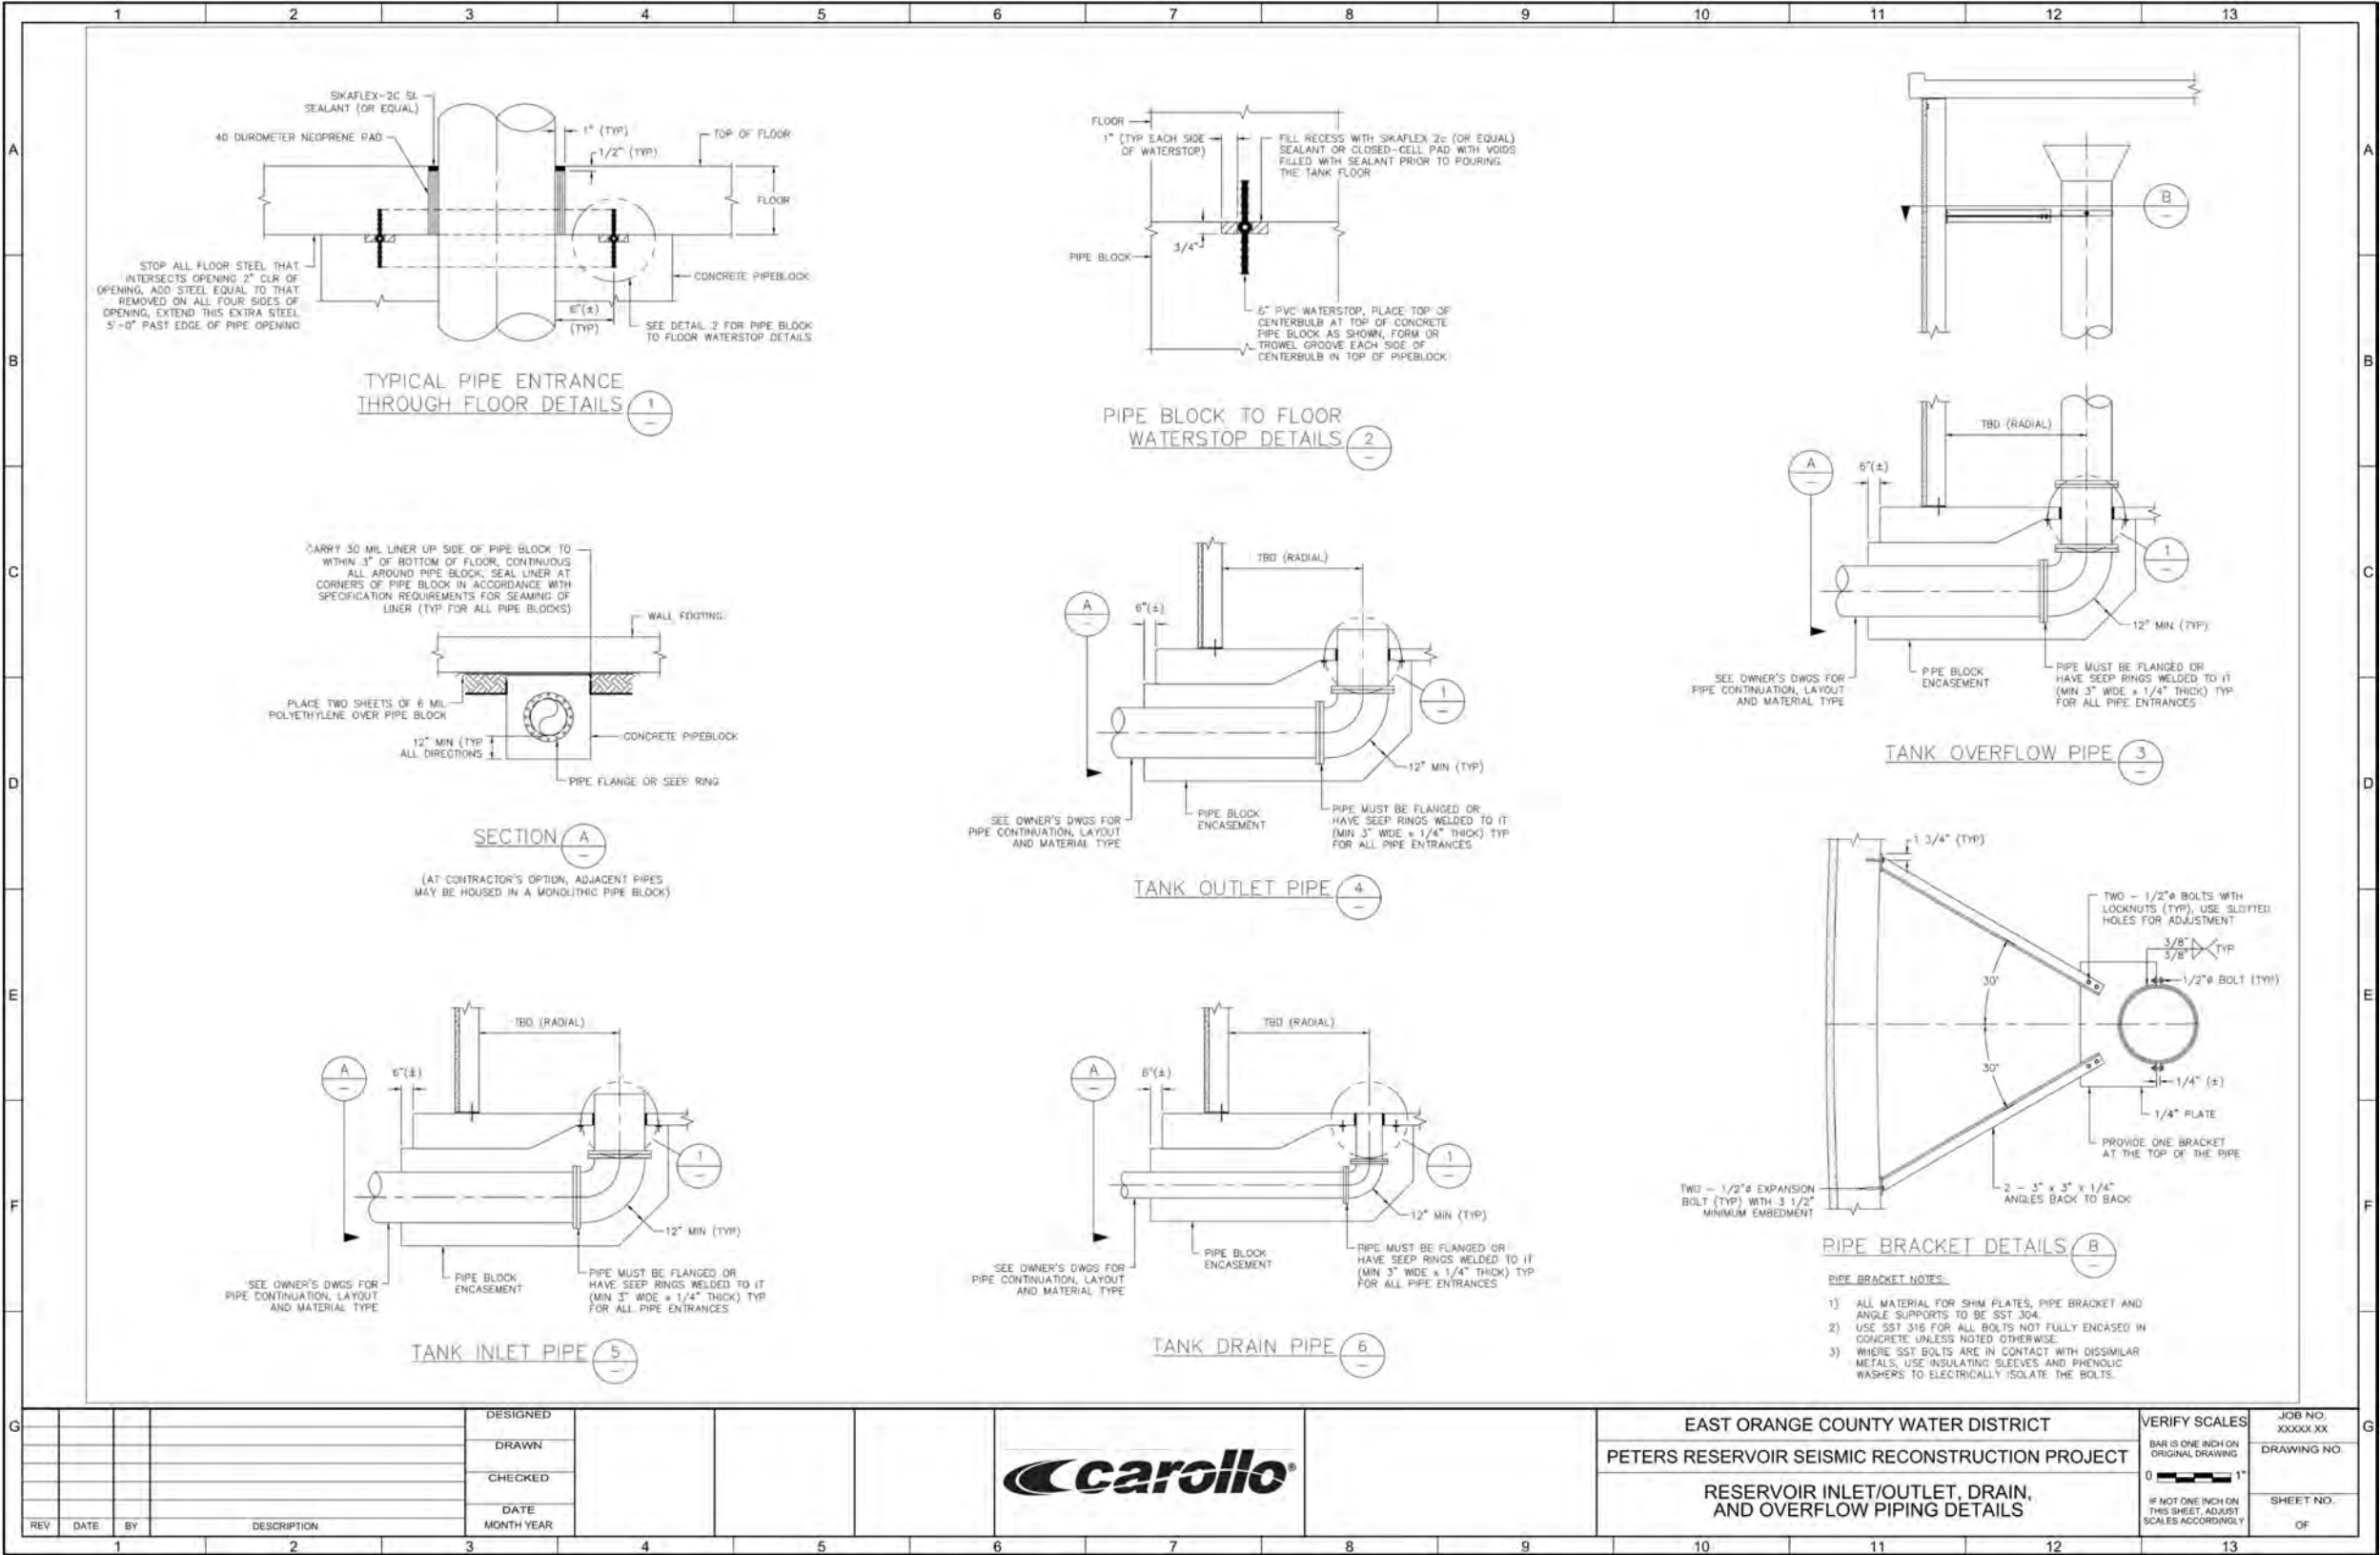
Reservoir Inlet/Outlet, Drain, and Overflow Piping Details
